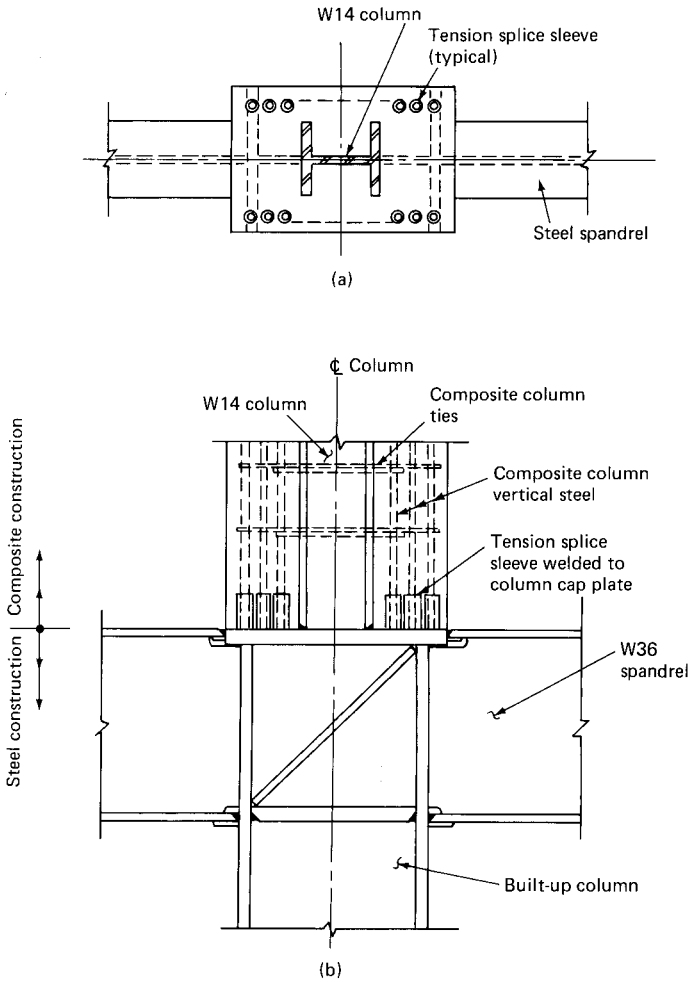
Composite column-steel column connection detail. (a) Plan; (b) elevation.
